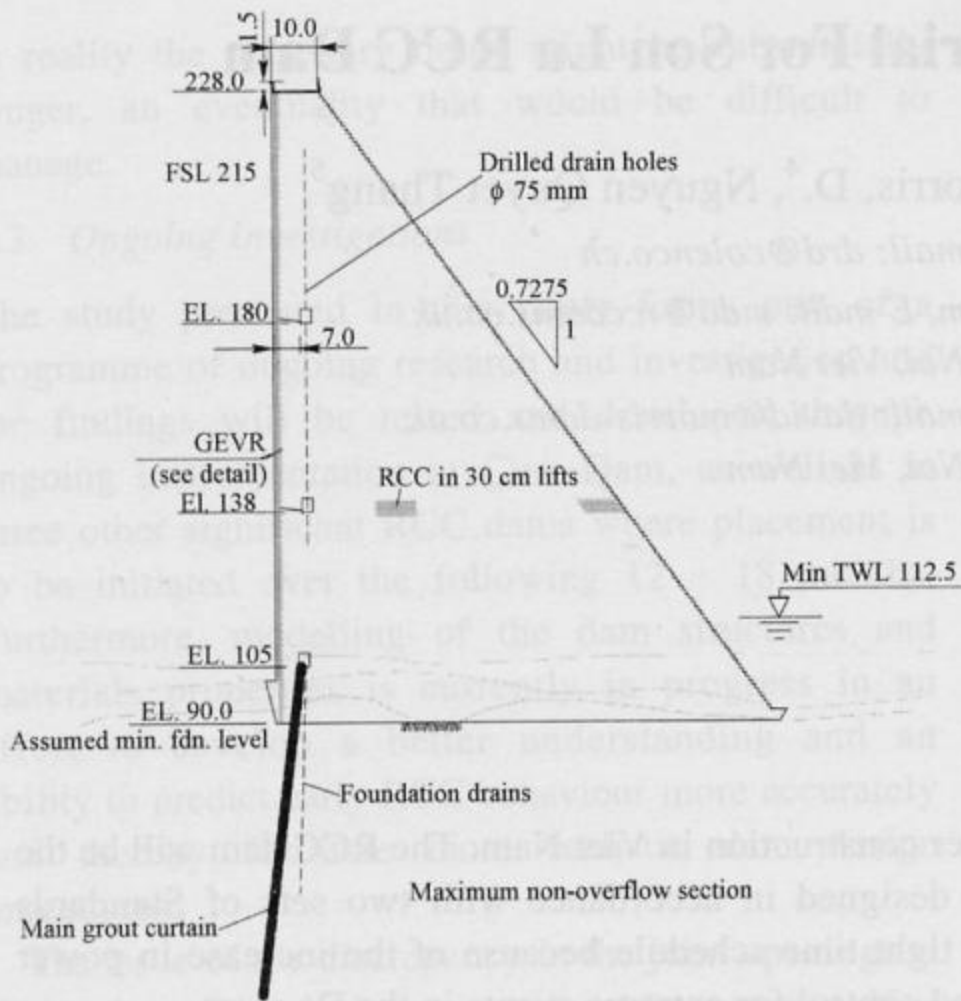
Typical cross-section of Son La dam at the maximum non-overflow section
